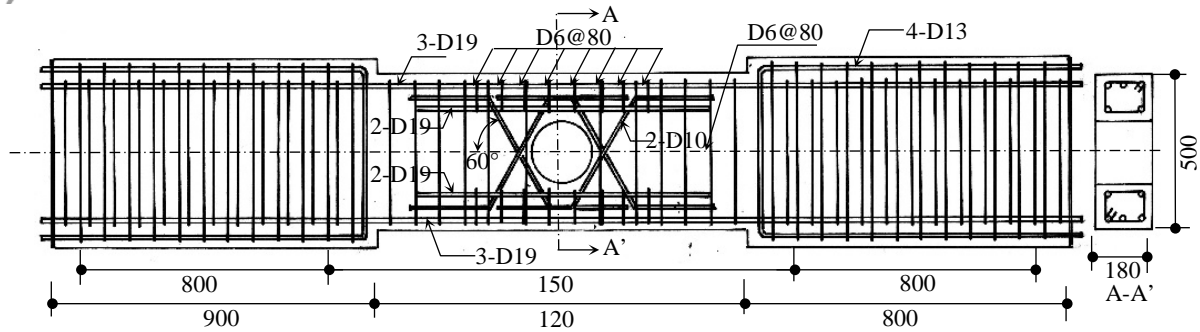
An example of reinforcing arrangement (e.g. No.2 specimen)
